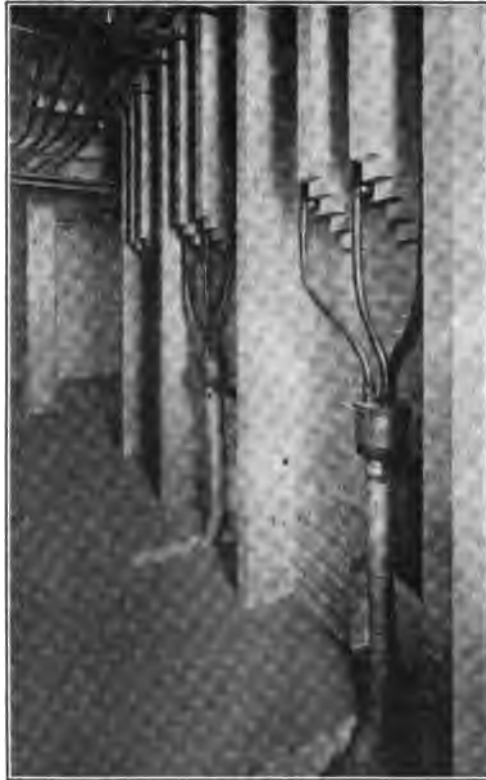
High-Tension Feeder Cables in Basement entering Conduits. (Westinghouse, Church, Kerr & Co.)
